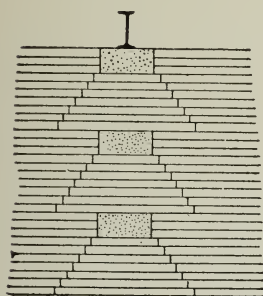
Bond-stones and Template in Brick Wall. Incorrect Method of Construction.
